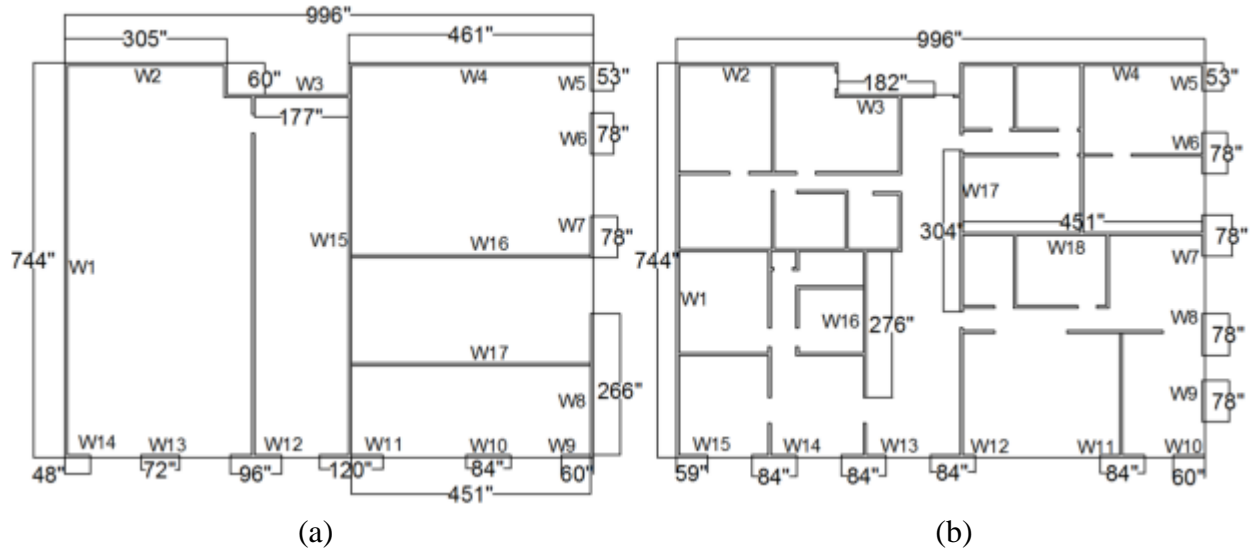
Floor Plan 7 – Four-Story Soft-Story Office Building with Garage Doors Lining Large Portions of Bottom Story: (a) First Story; (b) Upper Stories
